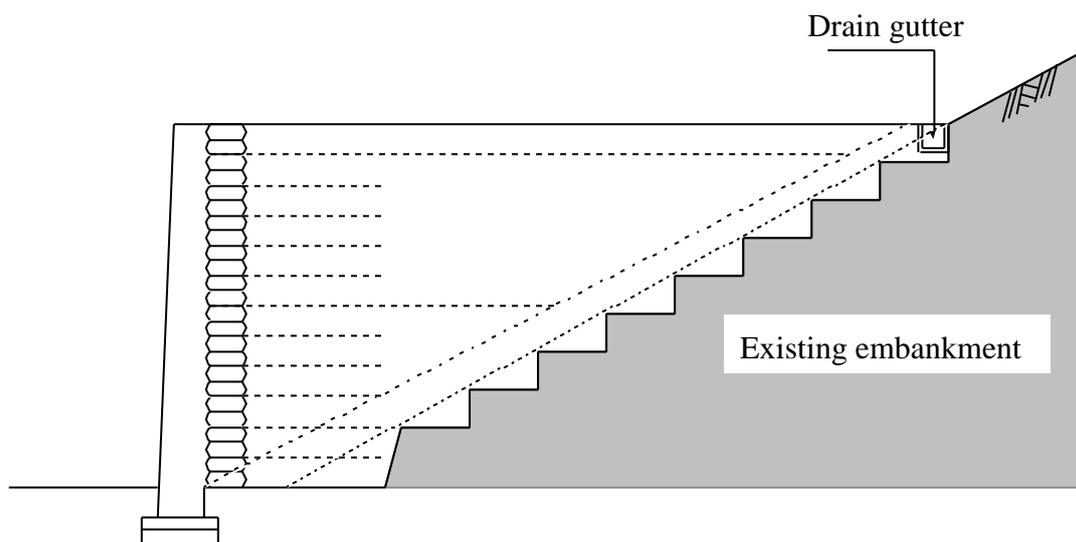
Example of drain gutter when widening the embankment
